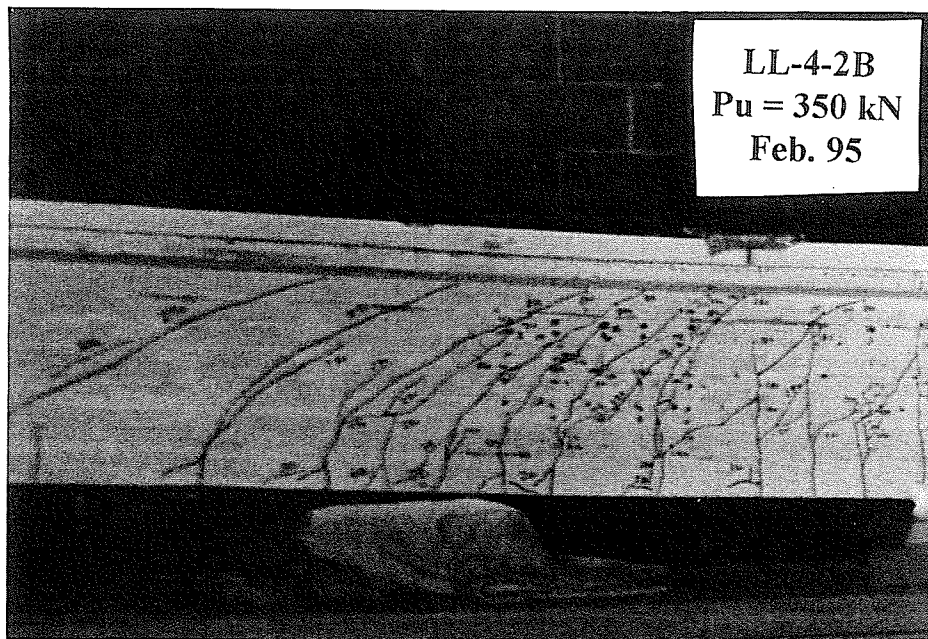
(d) Diagonal crack pattern of beam LL-4-2B
